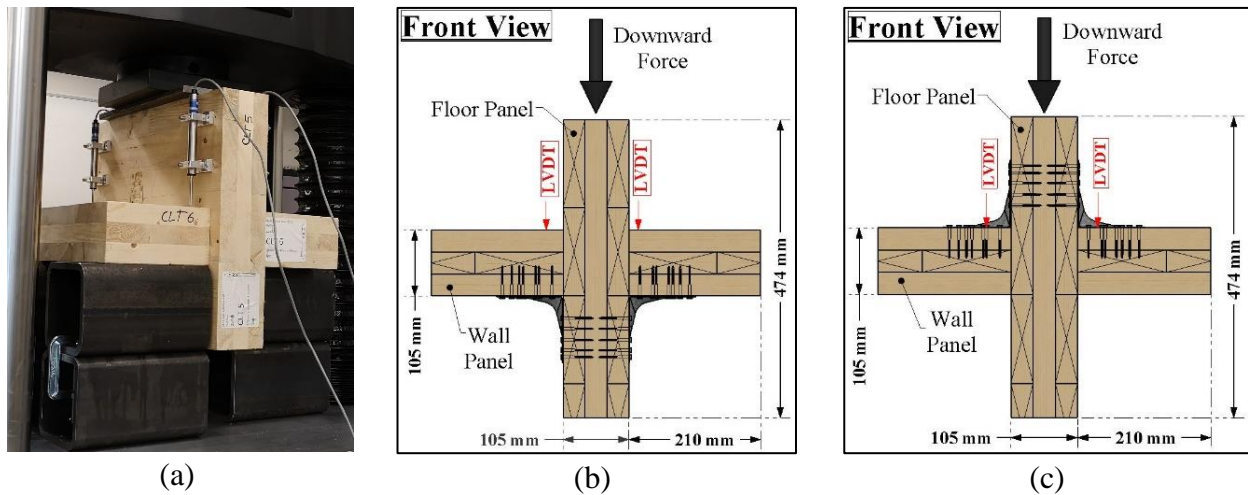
shows test setups of cyclic in-plane shear tests. Similar to cyclic uplift tests, floor panels were held in place by two parallel rectangular hollow steel sections while wall panels were clamped at the top to the MTS testing machine. The out-of-plane rotation of the floor panels was controlled by the bottom and top plywood sheets attached to them (Figure 2.10 a).
